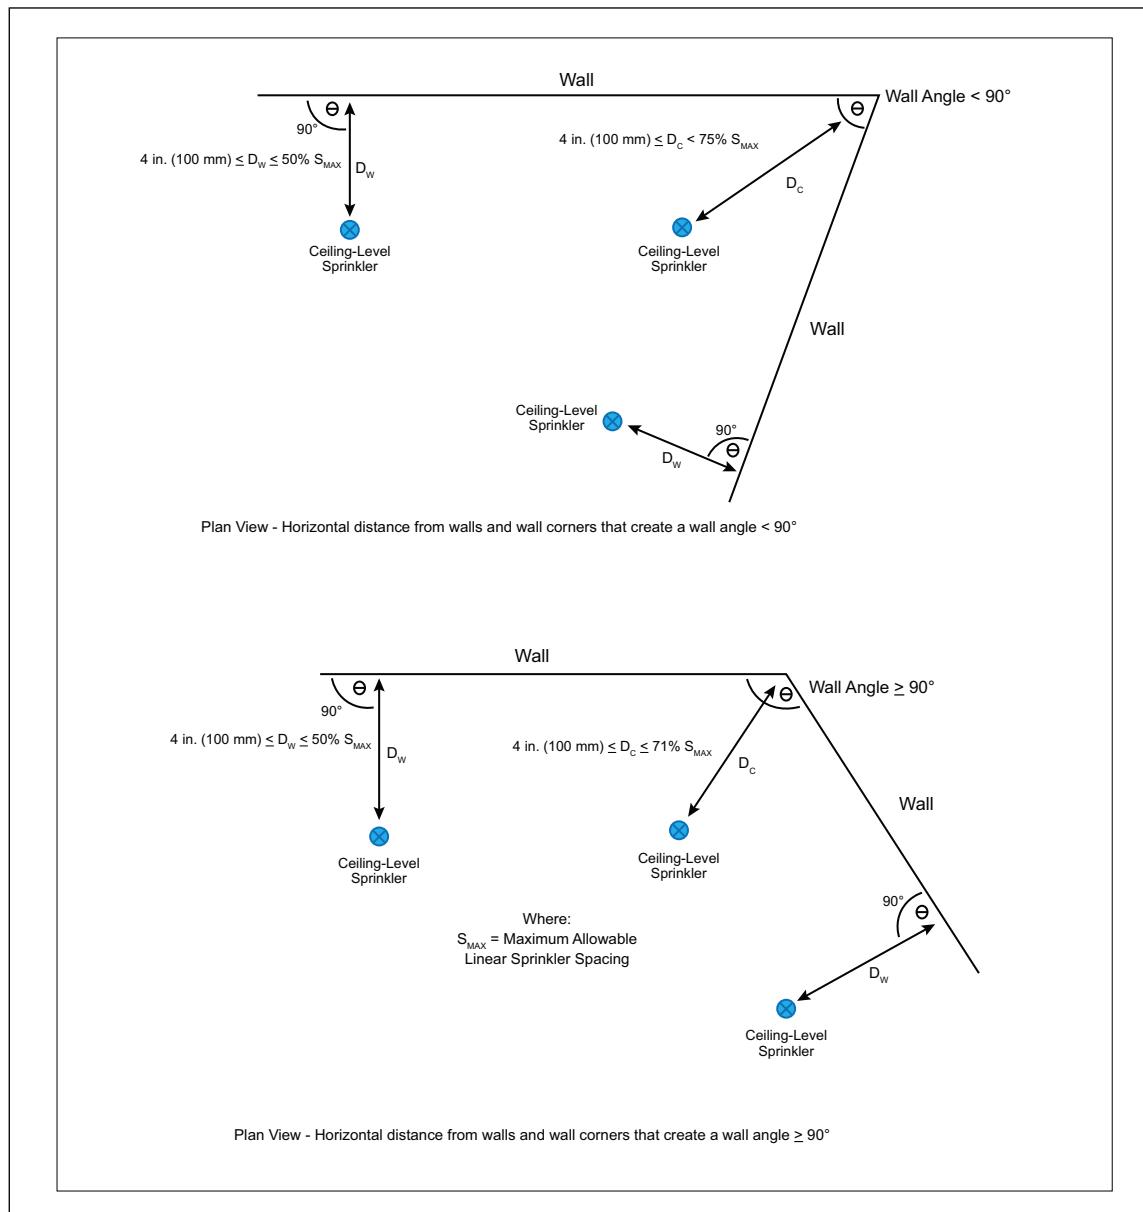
Horizontal distances from walls and wall corners to Nonstorage pendent and upright sprinklers
